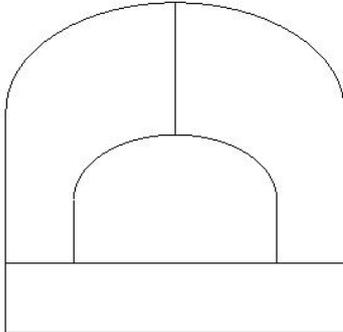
A tunnel profile divided into pilot, two stopes and the bench.
